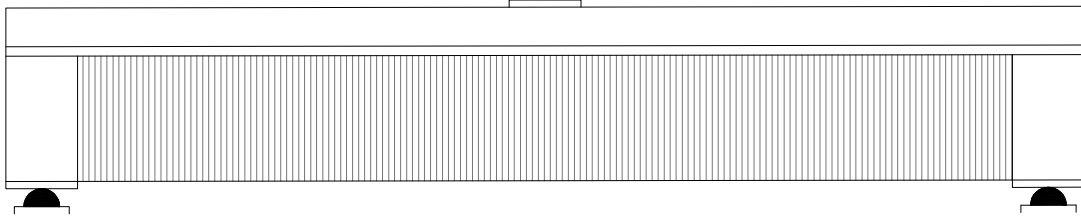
Strengthening configuration with externally bonded CFRP sheets in a U-wrap configuration.
